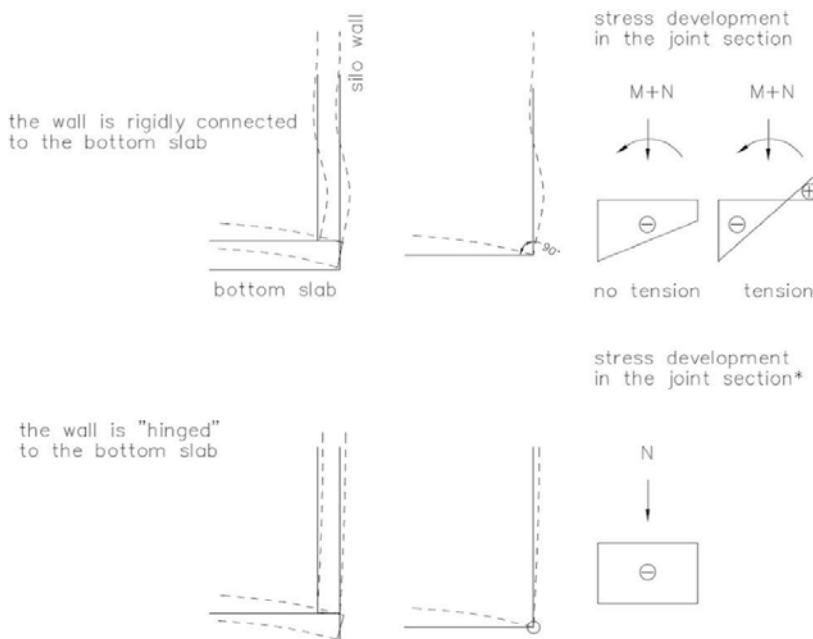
Static system – the outer wall rigidly connected to the bottom slab (90° angle remains constant under the deformation) and hinged joint between the wall and the slab (free rotation, the translation between the wall and slab remains restrained).
